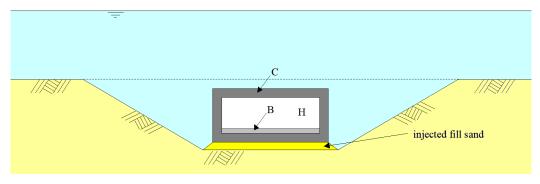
Cross-section of a just immersed tunnel on a sand fill. C = concrete volume; B = volume of ballast material; H = volume of he empty space in the tunnel.
